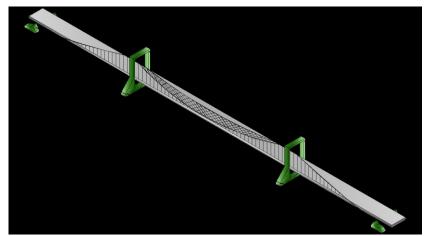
Prestressed suspension bridge with the cable truss as the main load carrying structure
